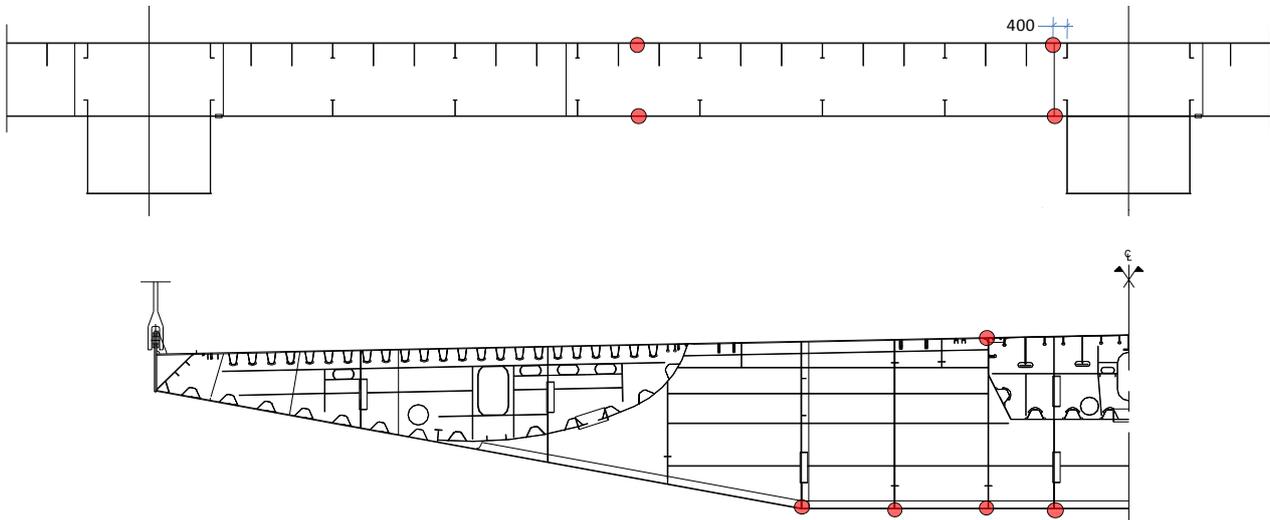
Stress-history plots location for roadway, railway and cross girder
